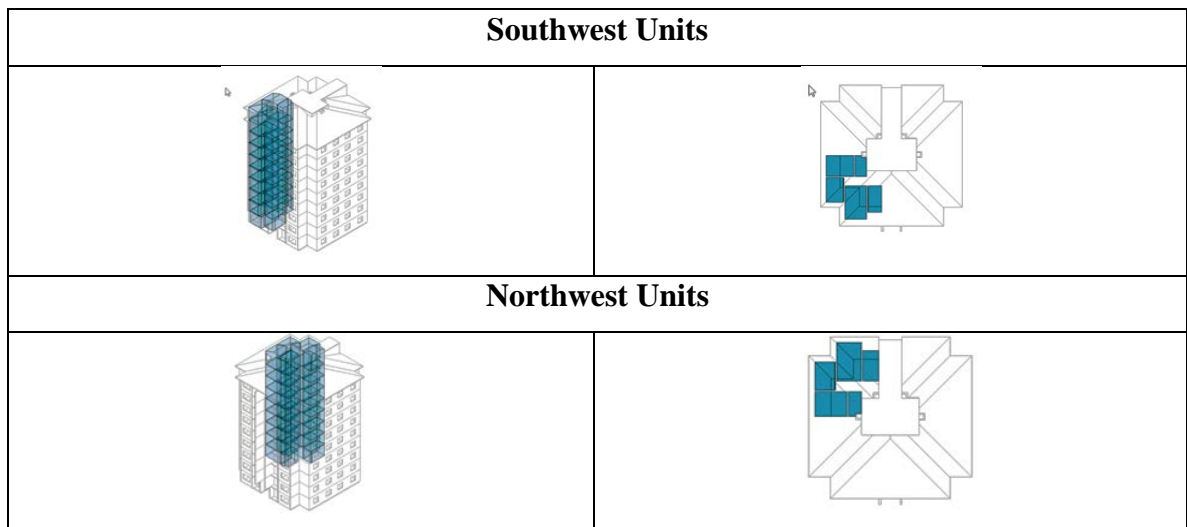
Southwest and Northwest Unit’s Location in the Building
